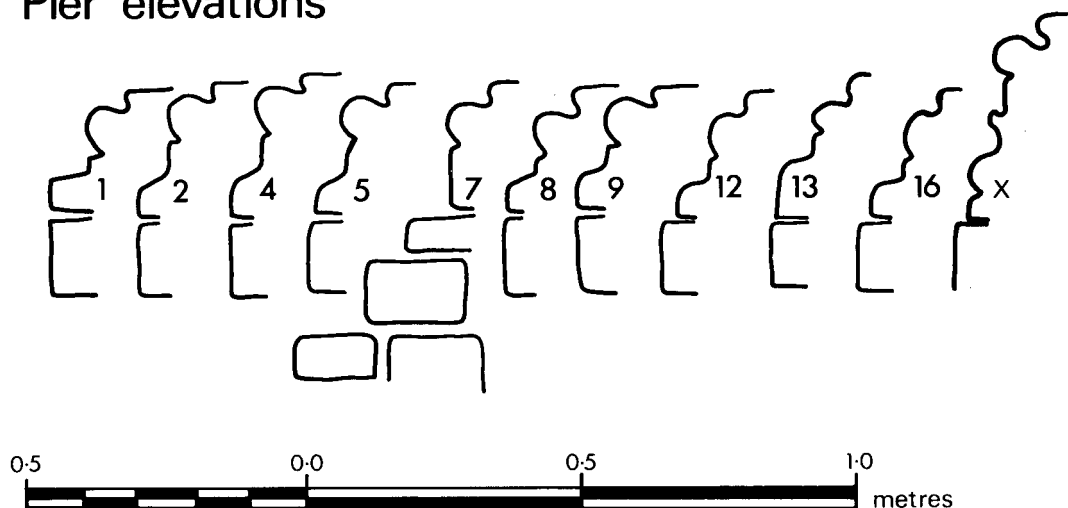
Westminster Abbey. Redevelopment of 20 Dean's Yard 1975-77. Pier elevations. The numbers correspond to those in Fig. 3. Pier base X is a waterholder base from the west wall of the south transept of the abbey church
